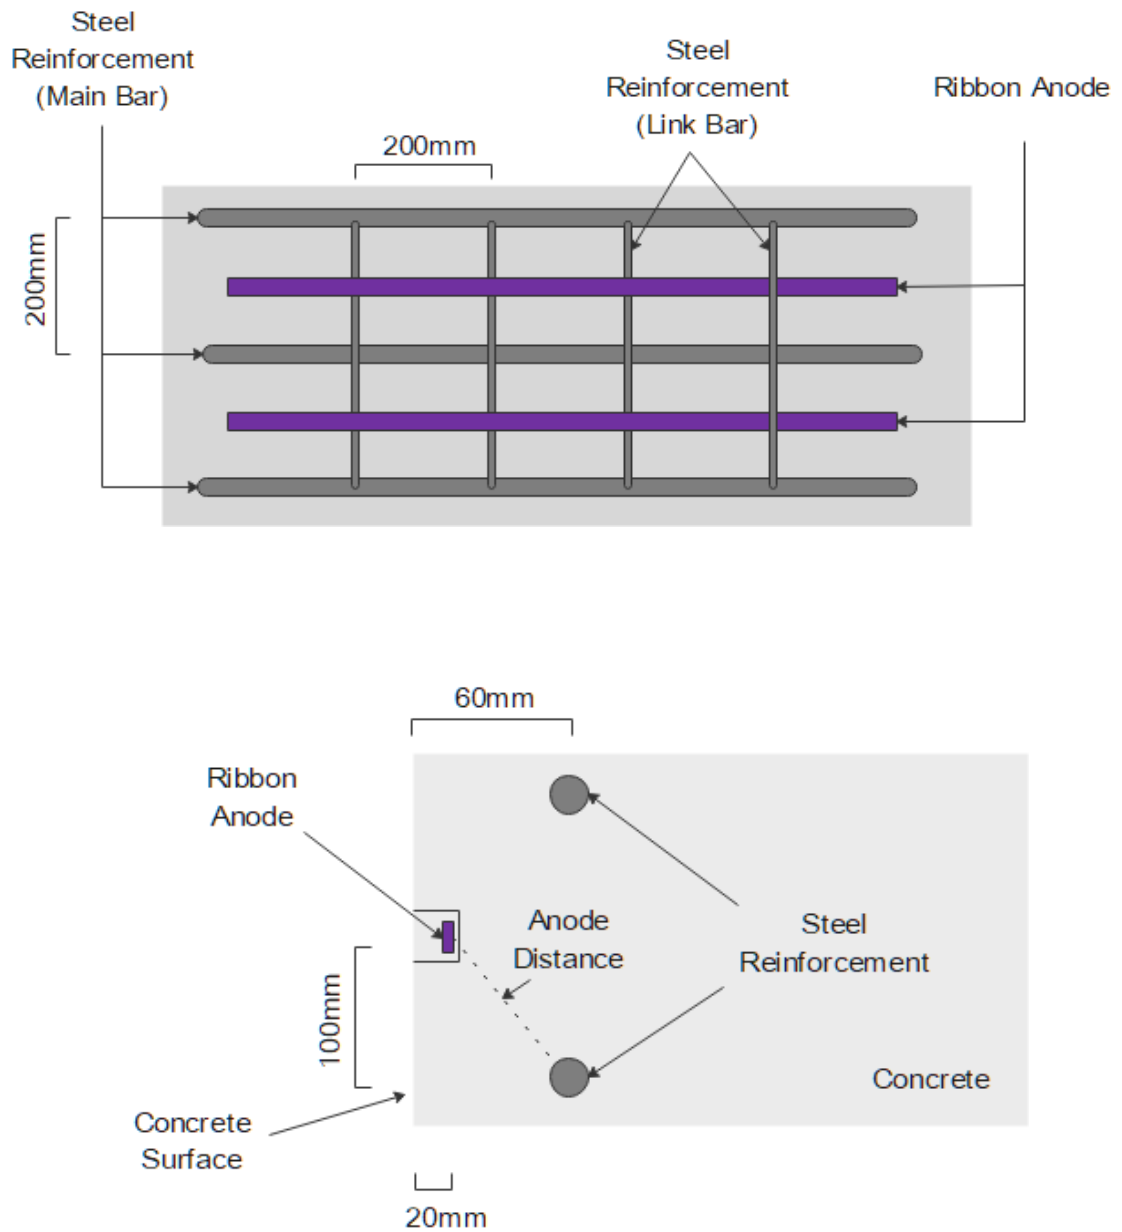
Typical ribbon anode and rebar layout and spacing
